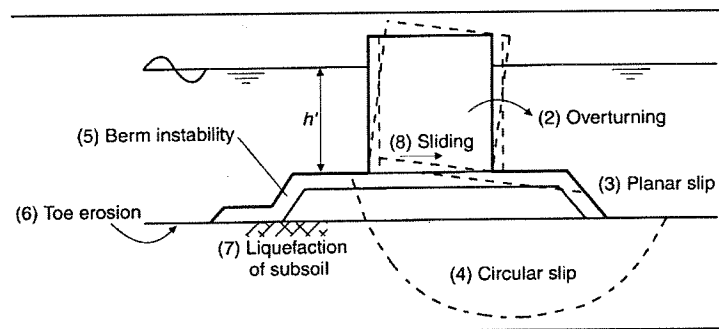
Failure mechanisms of a caisson breakwater [lit.3].
